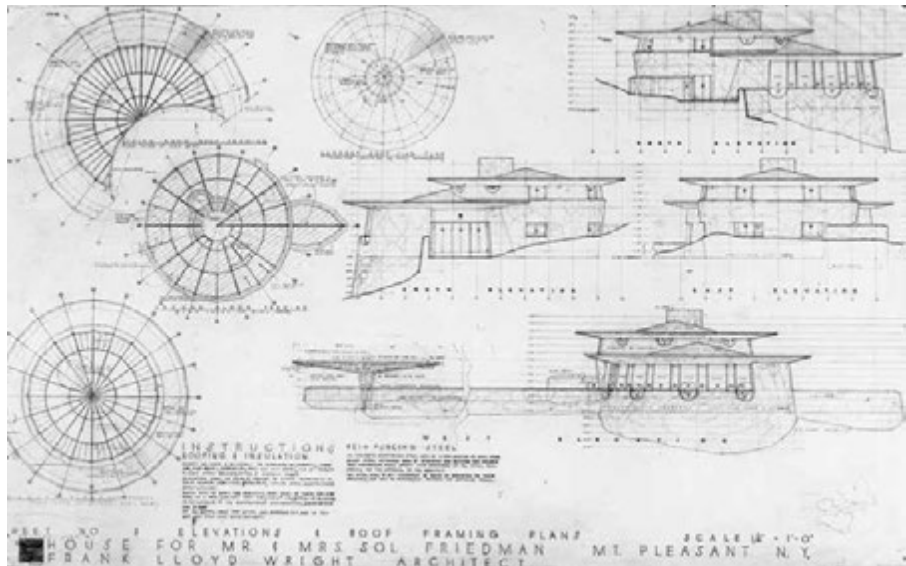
Sol Friedman House, elevation and roof framing plans. [Drawing: courtesy of FLLWFA (MOMA / AA&FALCU)]
